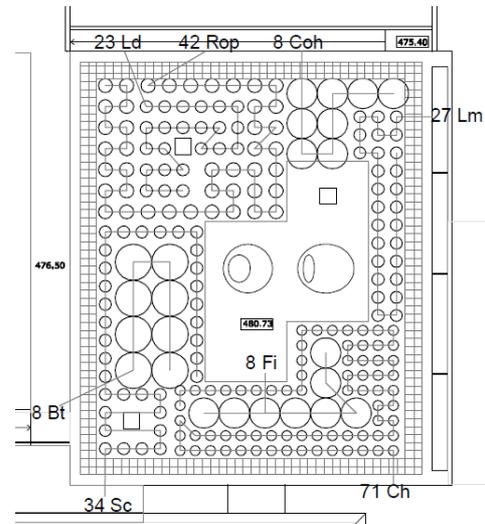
Vegetation plan of *Portalegre* library green roof project.
